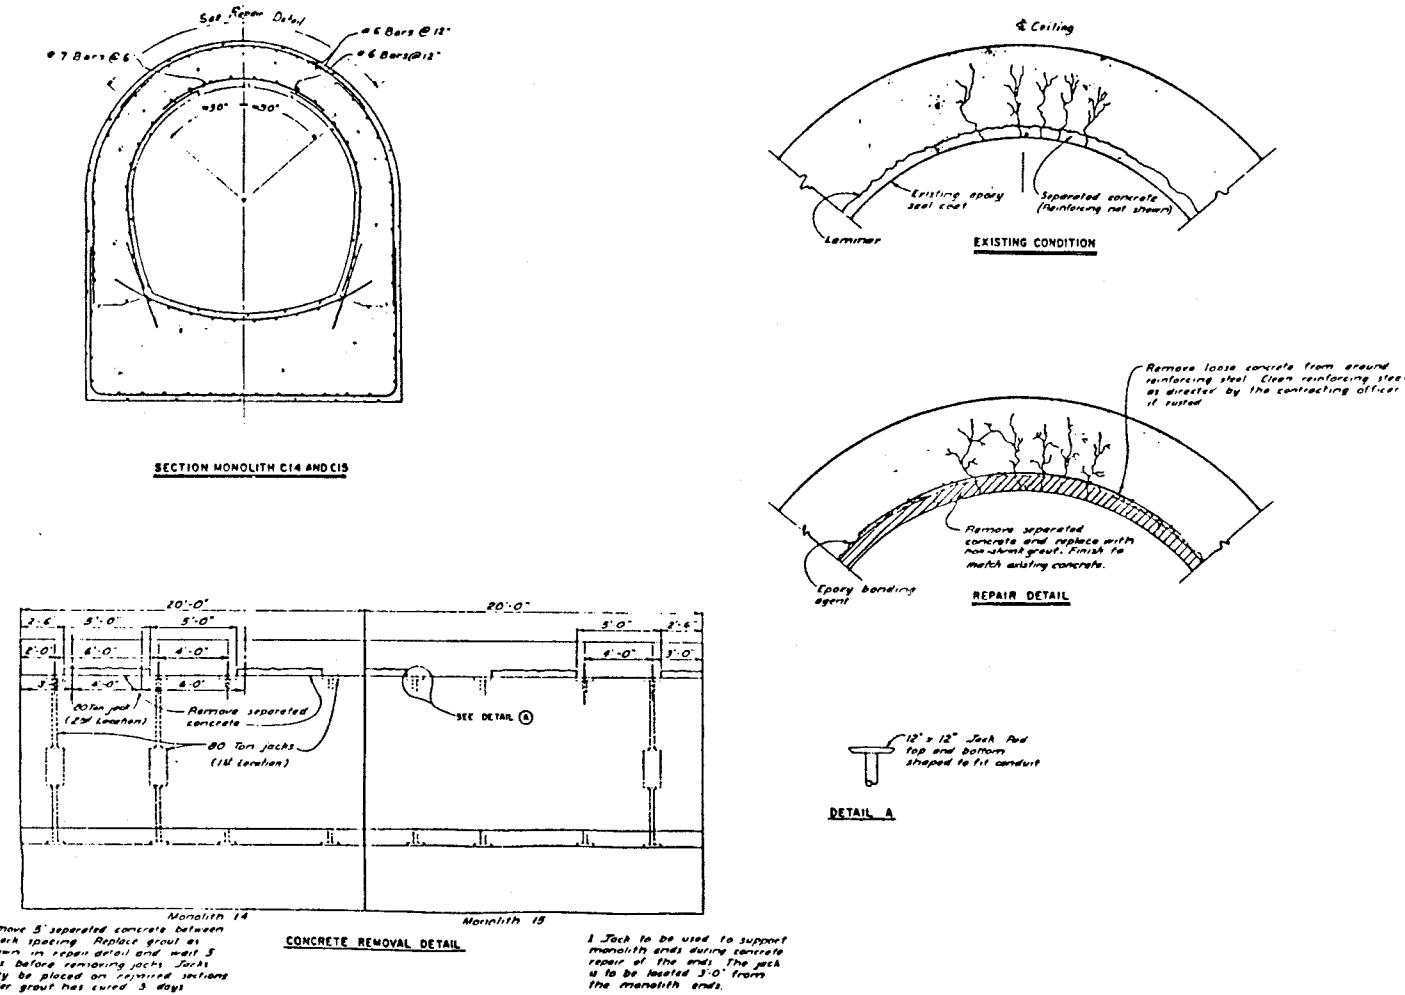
Details of removal and replacement concrete in crown of conduit, Eau Gallie Dam.
